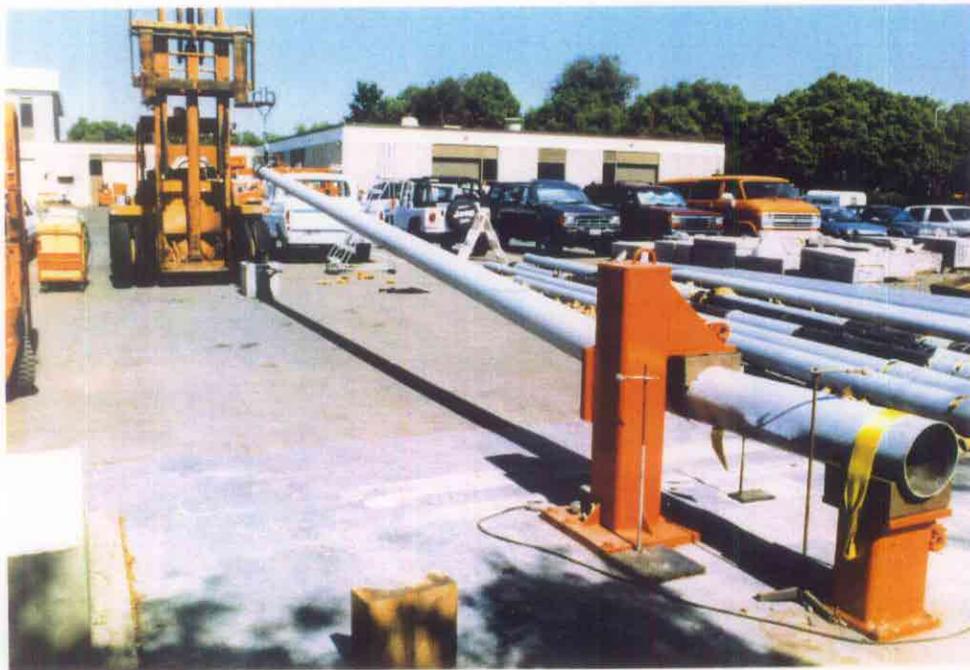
Direct burial test pole mounted to combination pole butt/ground line support fixture.
